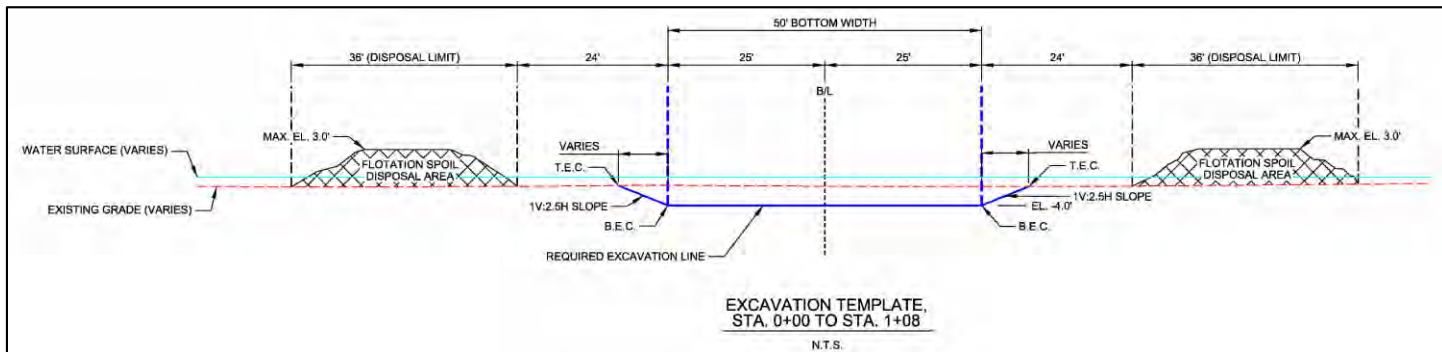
Plug excavation, access channel, and access channel stockpile areas cross-section view
